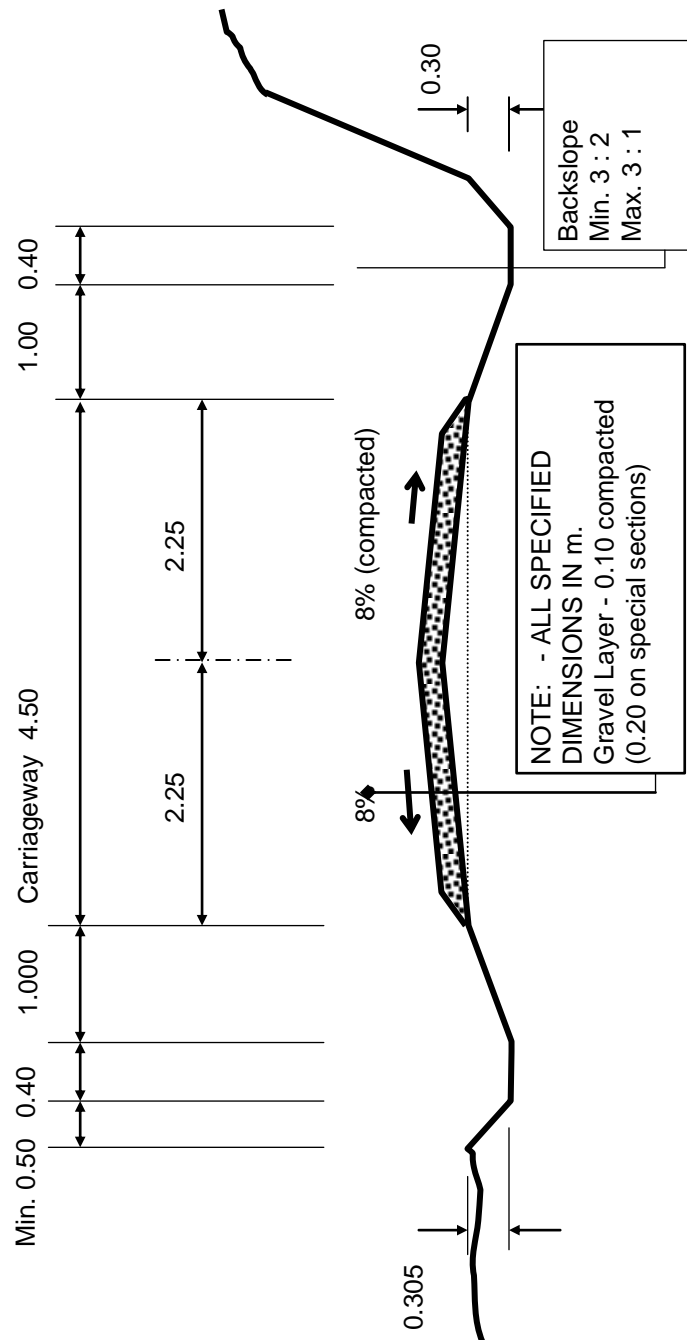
CROSS SECTION B (REDUCED CROSS-SECTION)
